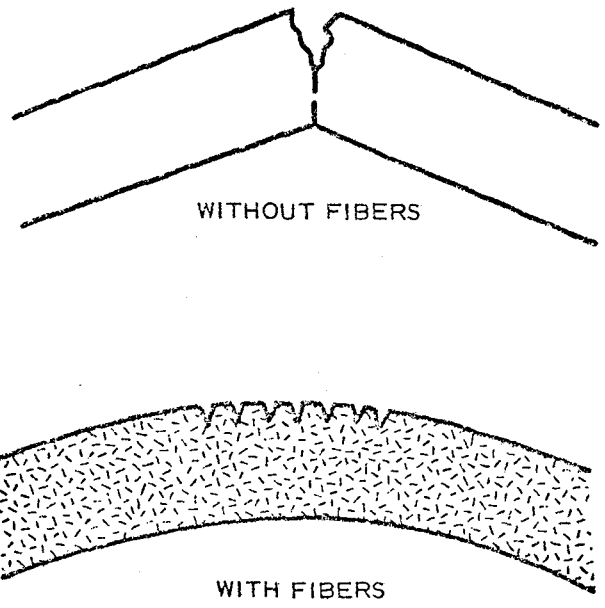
IDEALIZED CRACK ARREST MECHANISM
